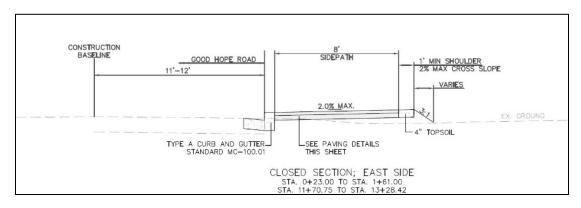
Proposed Typical Cross Section – East Side Intersection Pinch Points
